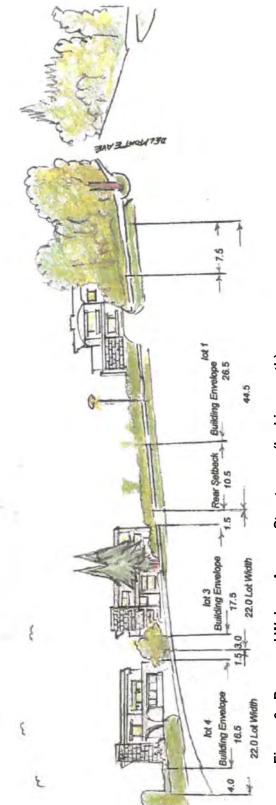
Proposed Walema Avenue Streetscape (looking south)
